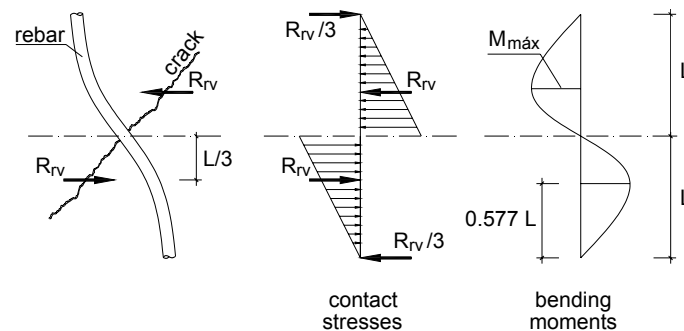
Dowel mechanism of vertical reinforcement at shear failure of a reinforced masonry wall (Tomažević, 1999).
